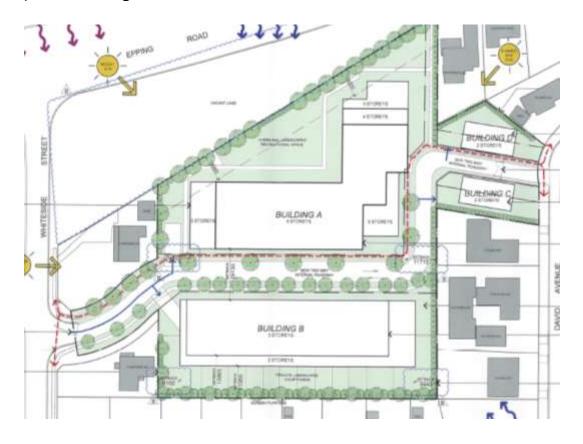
Site Plan (Source: DA drawing DA0-.02B)
